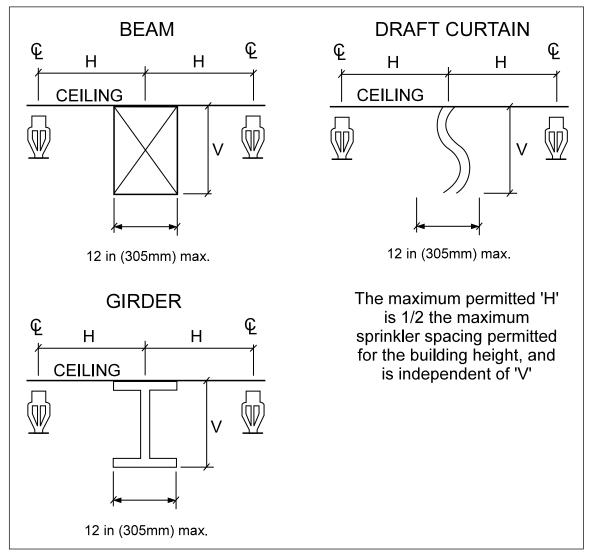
Alternative arrangement for obstructions no more than 12 in. (305 mm) wide at ceilings.
